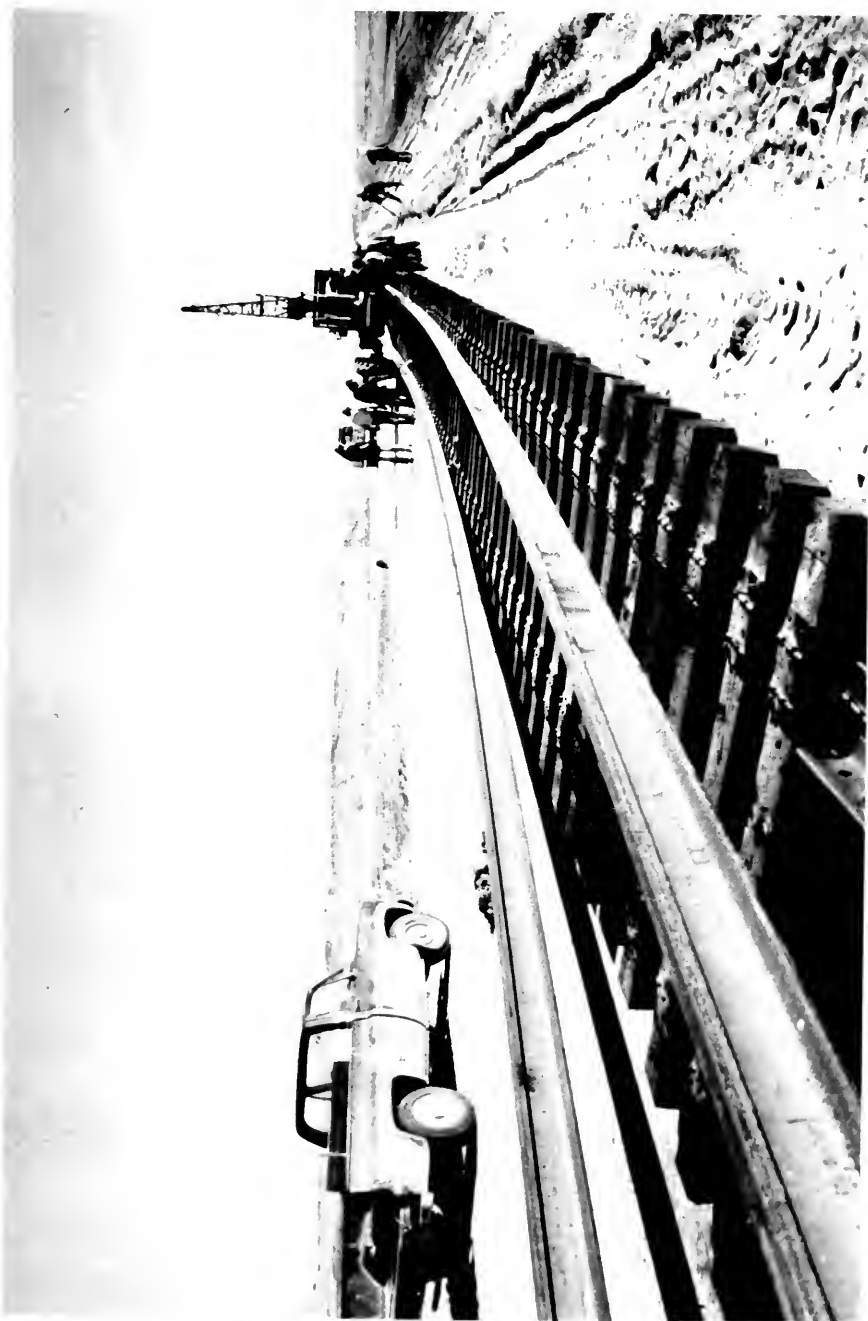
Pulling pair of welded rail strings onto pre-plated ties.
